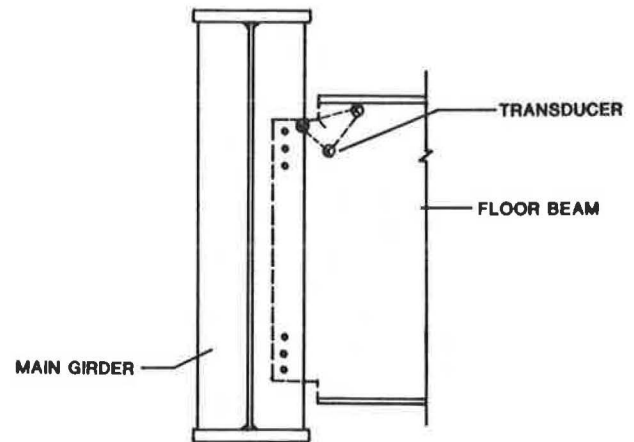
A typical detail for connection at a floor beam end and a main girder.
